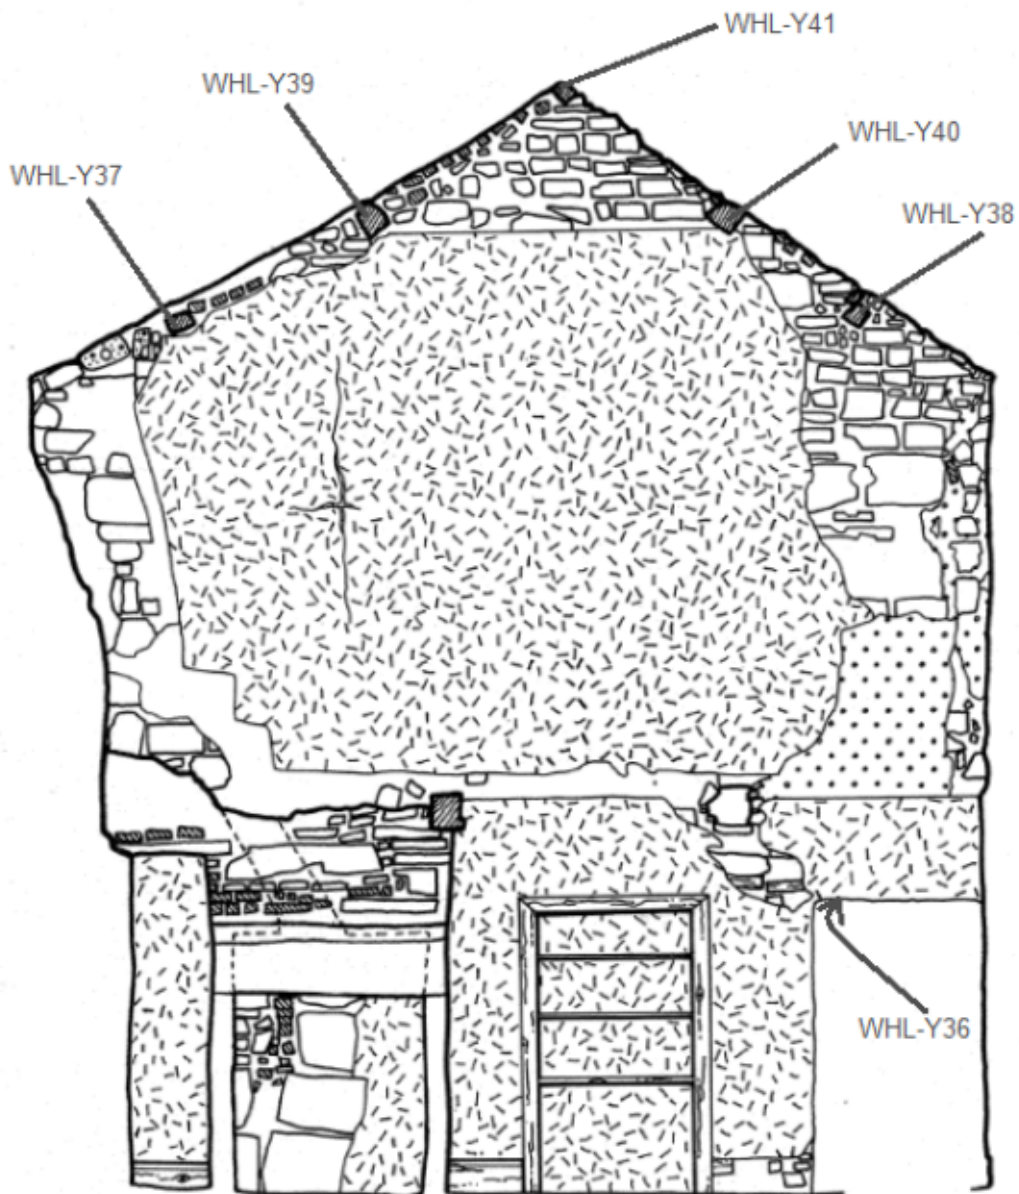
Interior wall between stables and bothy (west face), showing the location of sample WHL-Y36-41 (LUAC 1997)
